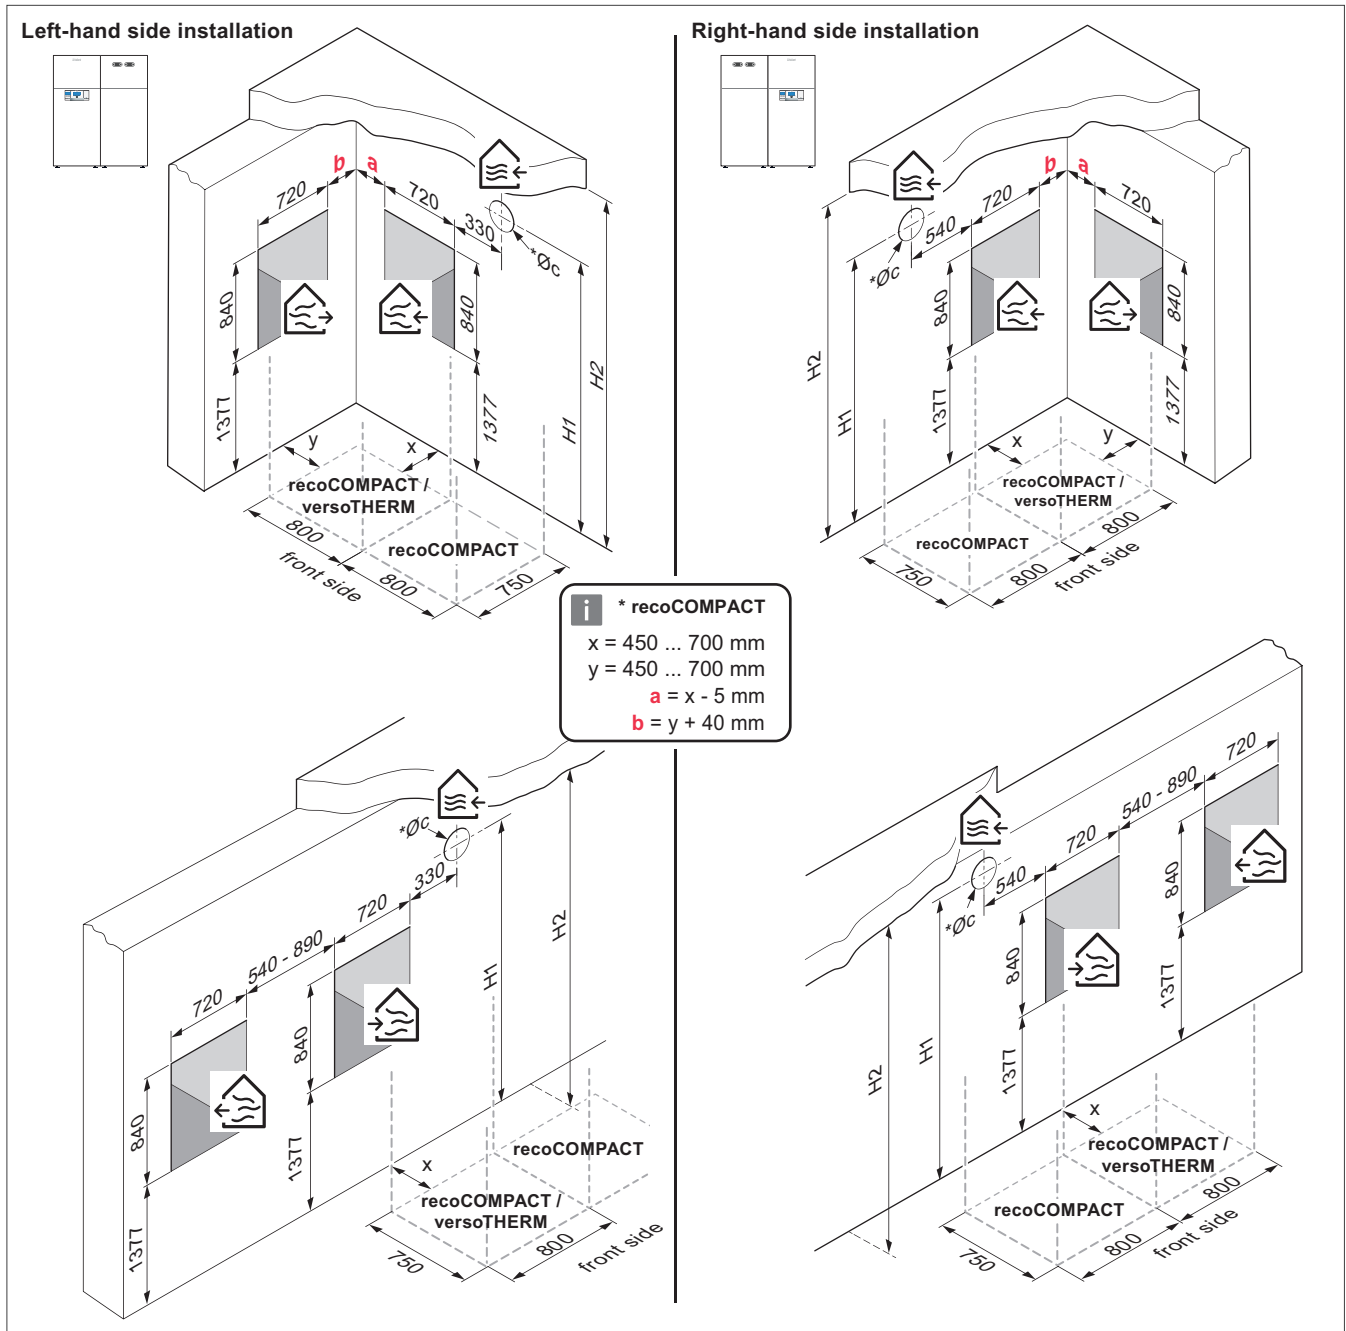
Wall-opening dimensions when using the Vaillant air ducts with a height offset of 410 mm
